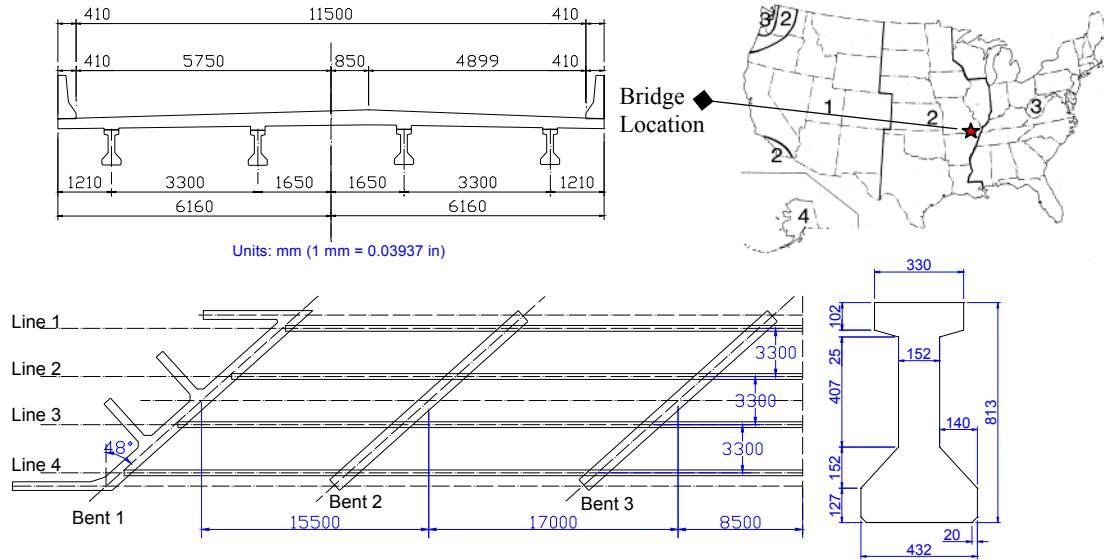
Bridge A6130 Alignment (Half Bridge), Cross-Section and Location
